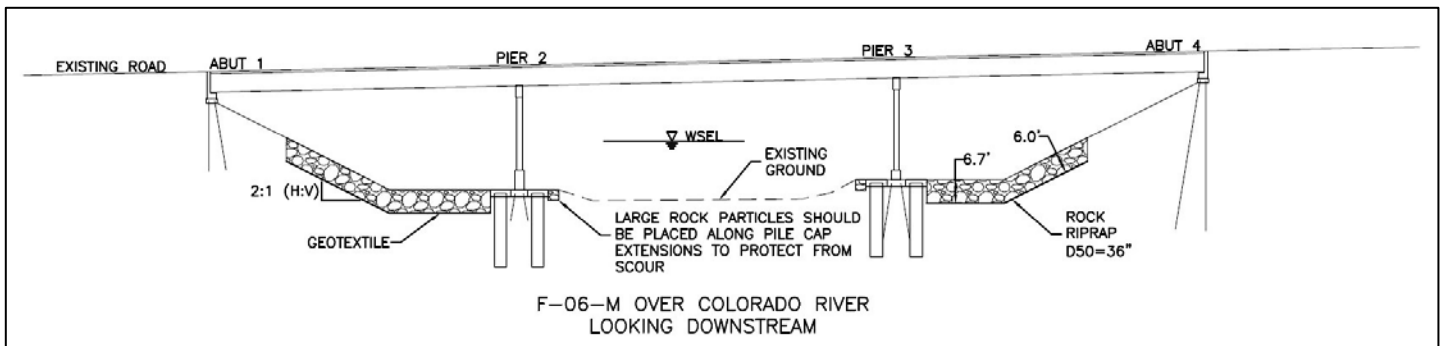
Cross-sectional view of Bridge F-06-M with recommended hydraulic scour countermeasures
